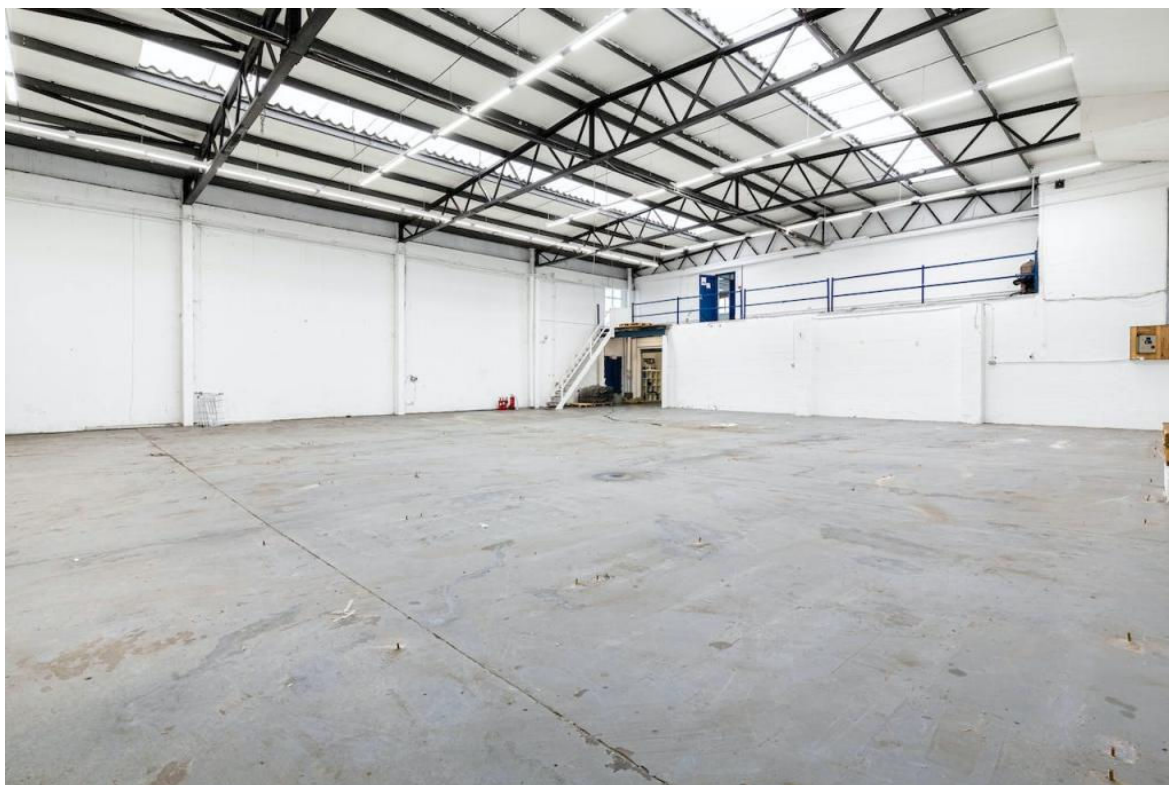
Internal view showing a typical industrial unit construction of masonry walls and corrugated roof
